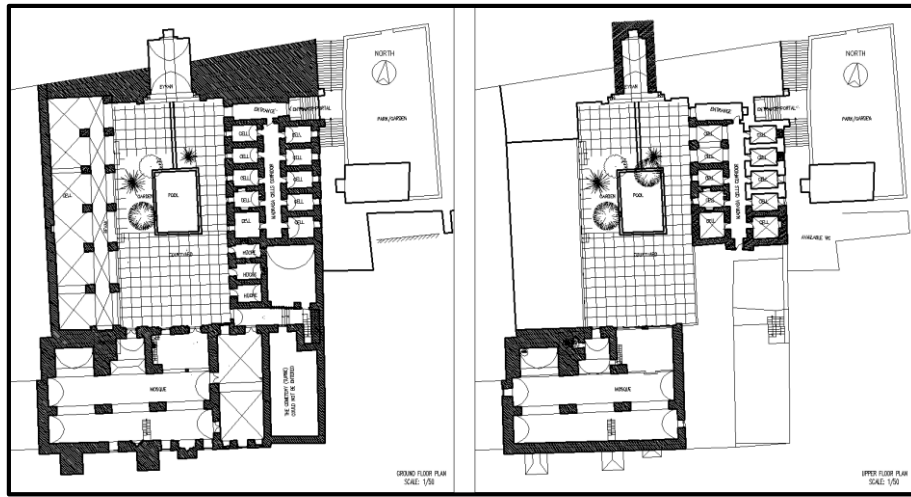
Şehidiye Madrasah Floor Plans (İbrahim Duyan Archive)
